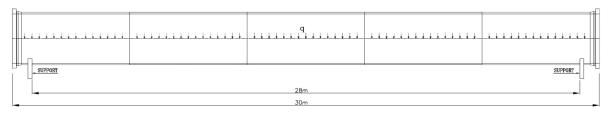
Schematic view of the 30 meter test string which fabricated by welding five pipes with 6 m length
